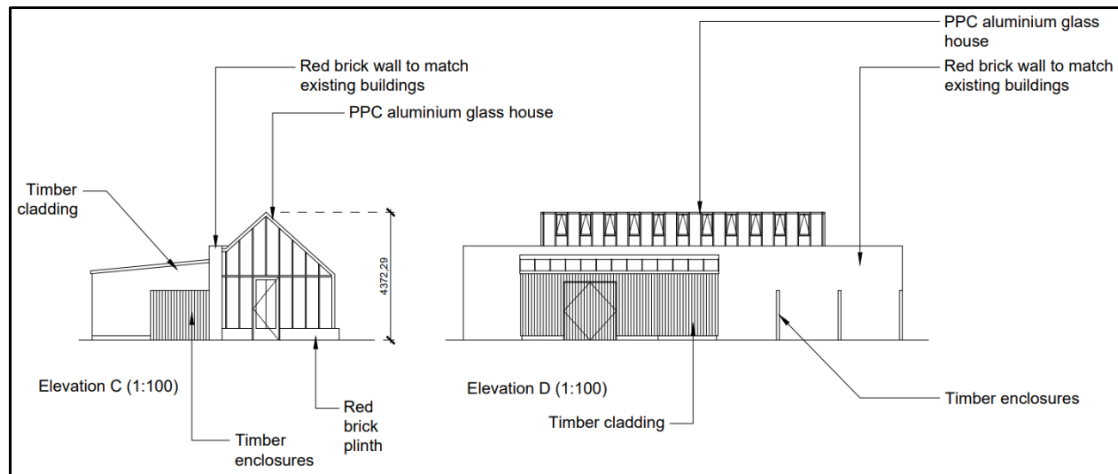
PROPOSED ELEVATIONS OF GREENHOUSE AND ASSOCIATED STORE (CLAGUE ARCHITECTS)
